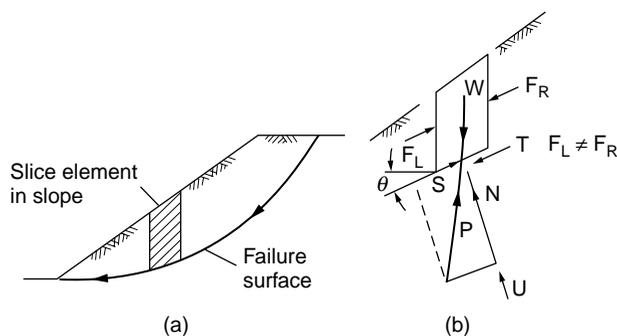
Finite slope with cylindrical failure surface (a) and forces on an element (b).
